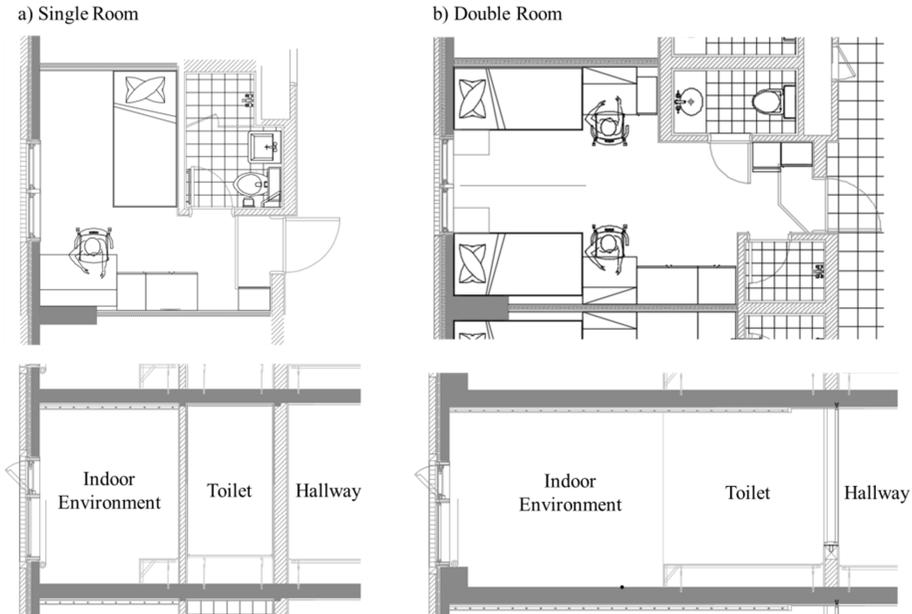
Plane and Sectional Plan of Single and Double Room
